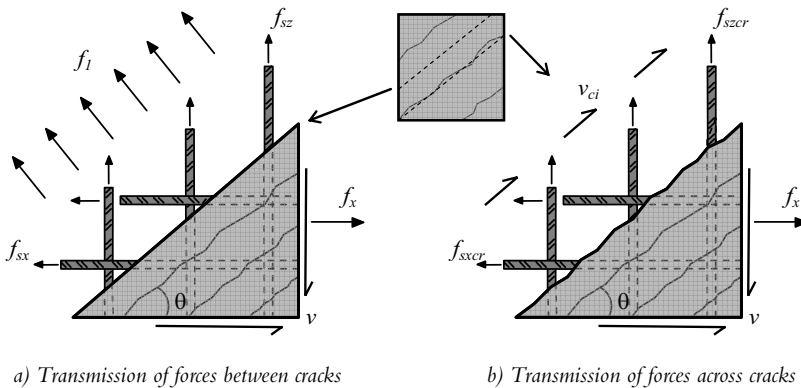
Transmission of stresses/forces a) between cracks and b) across cracks.
